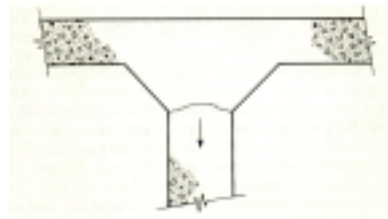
Plastic Settlement Cracking due to Formwork Restraint
